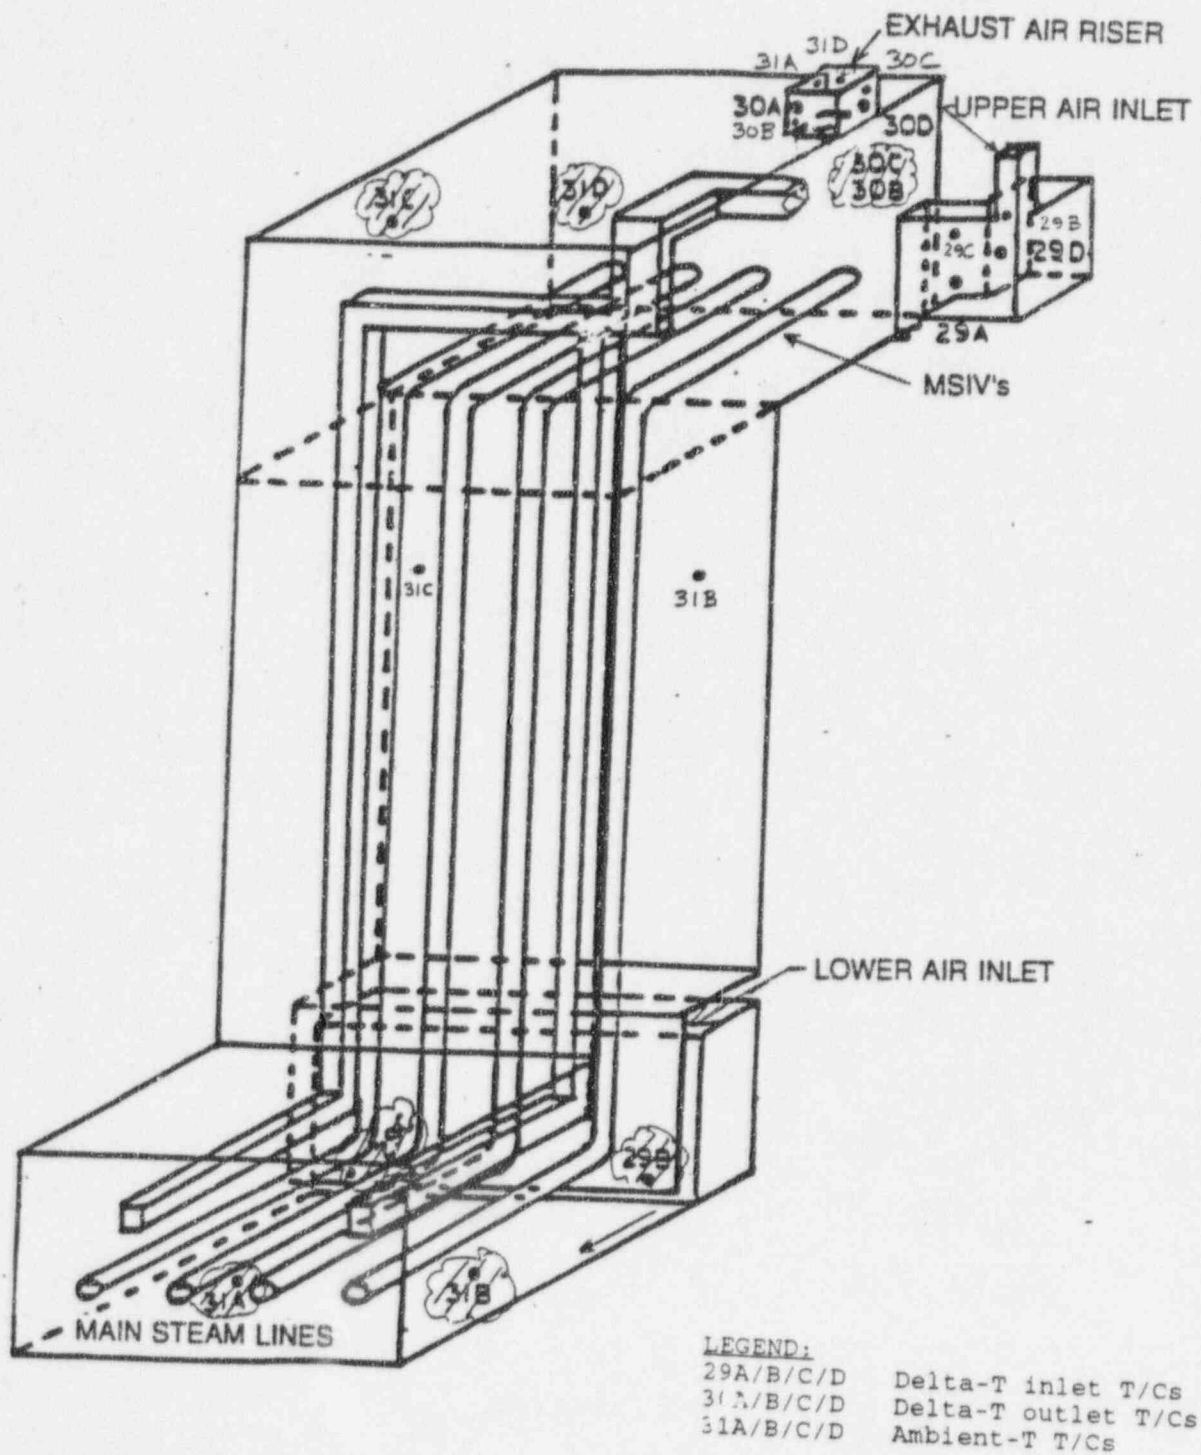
A: Sketch of Main Steam Tunnel - Proposed Configuration
